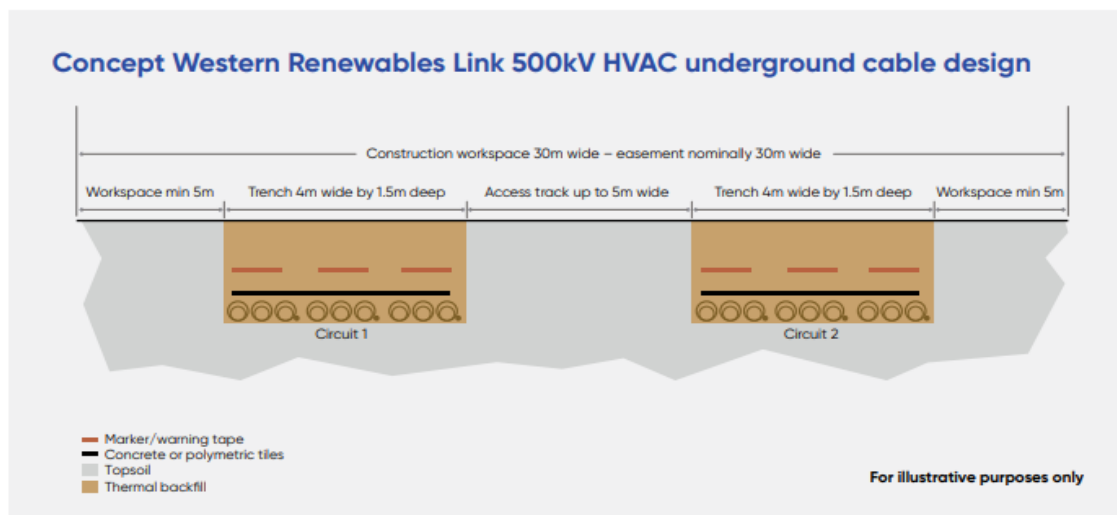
Typical arrangement of a HVAC double circuit 500kV underground cable easement
